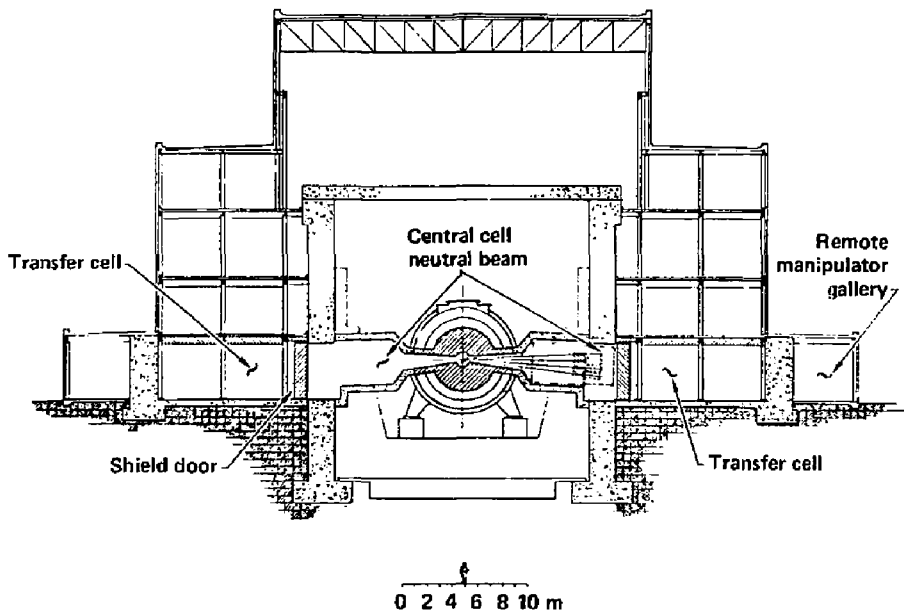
MFTF- α +T facility elevation through central cell (Building 431).
